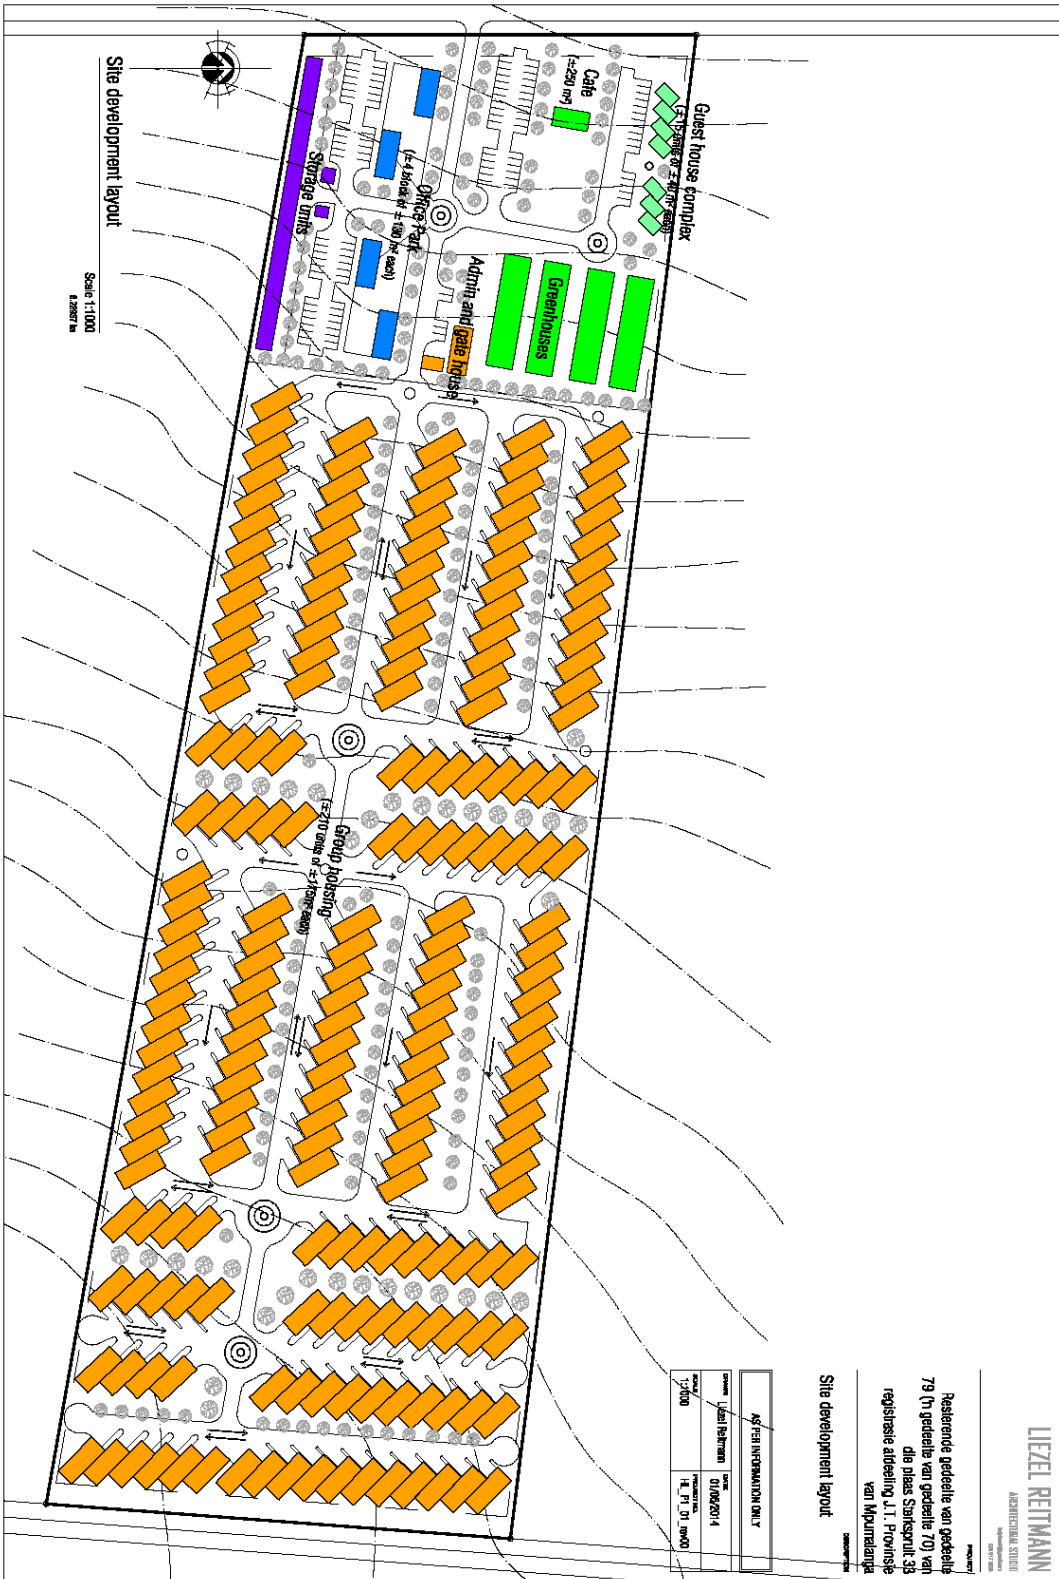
Proposed development layout plan (as supplied by Interdesign Landscape Architects).
